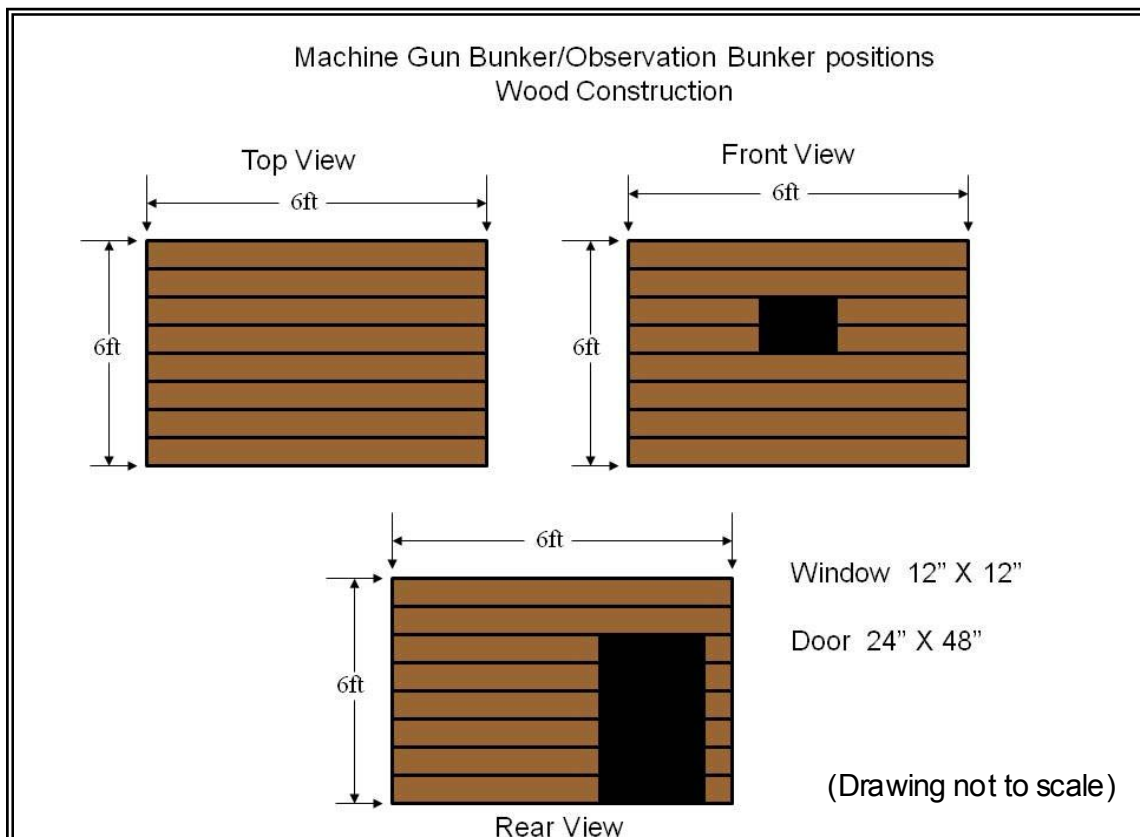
Representative Machine Gun / Observation Bunker Elevation Drawing
